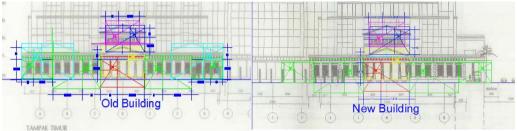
Scale and Proportion ratio (a) Old Building facades (b) New Building facades.
